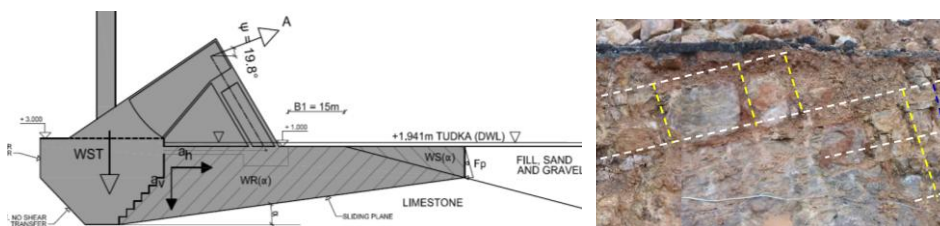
(a) Failure mechanism assumed for North anchor block; (b) Photo of interpreted bedding discontinuity planes in trial excavation wall (white broken lines)
